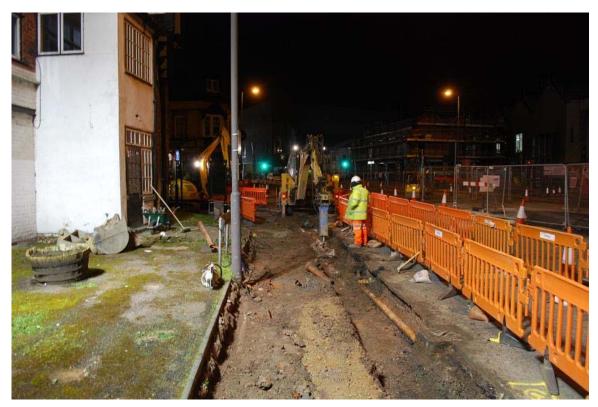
Blueschool Street; ground reduction for refurbishments. View west.
